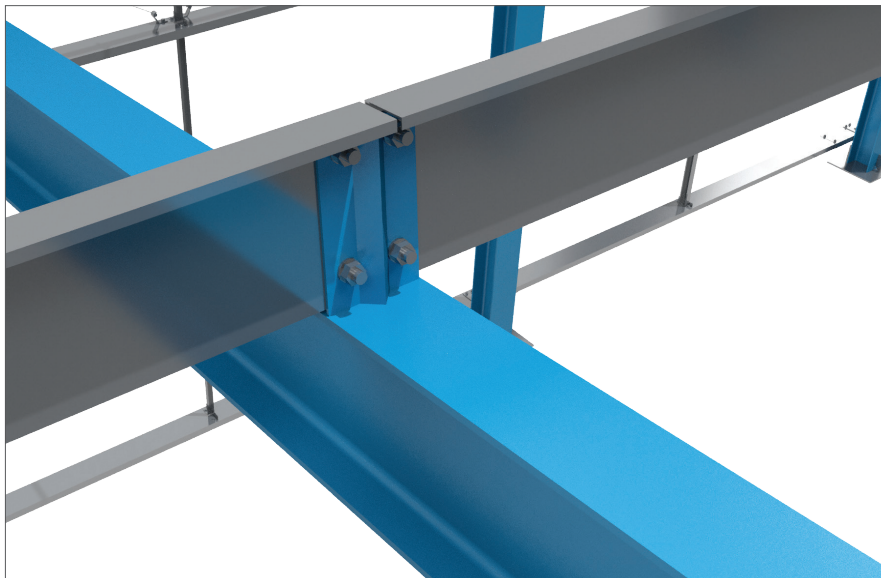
Detail of the purlin connection to the primary structure in the BUTT system
